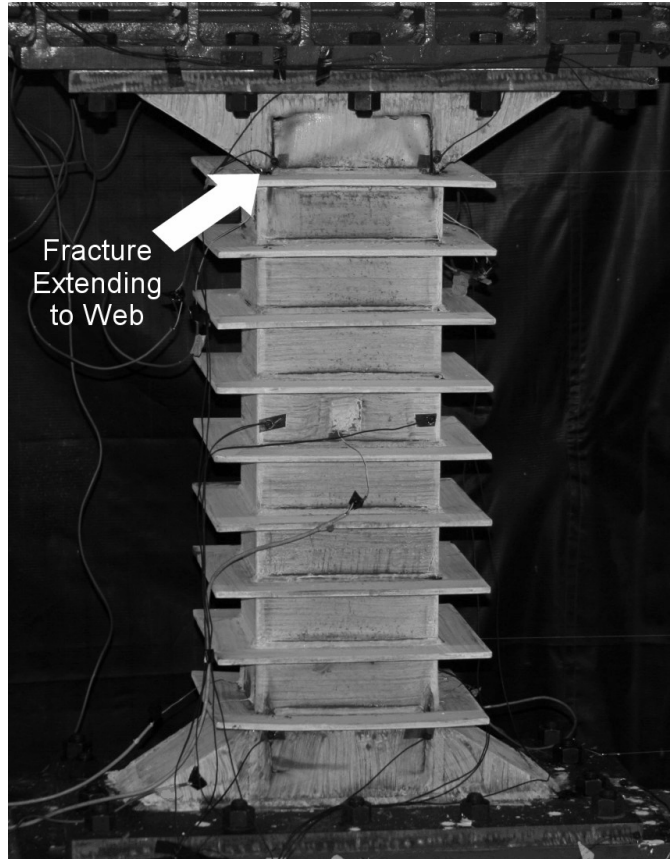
Fracture of Flange Extending to Web in Specimen X2L1.6
